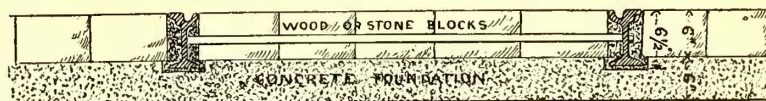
SECTION OF TRACK LAID ON CONCRETE—MONTREAL STREET RAILWAY CO.
